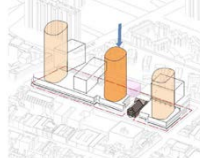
BUILDING SEPARATION: AMENITY
